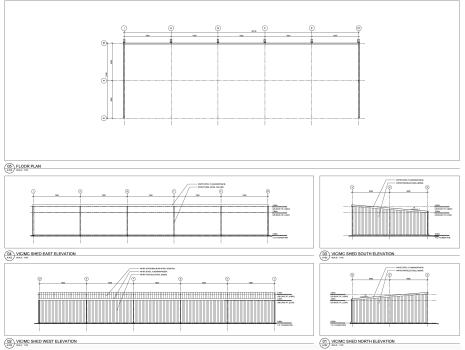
Proposed Floor Plan and Elevations for Accessory Building
